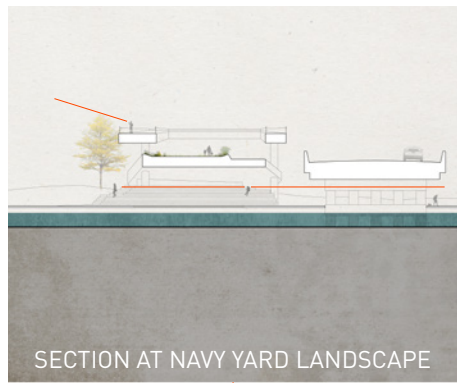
Site section with DC tunnel project shown in its proposed location.
